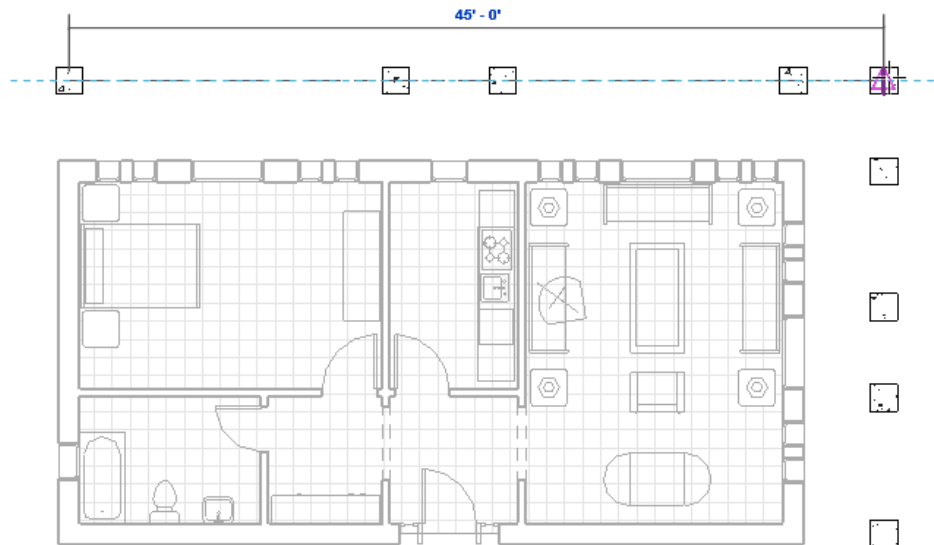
Adding the horizontal structural beam to the Design Option 1
